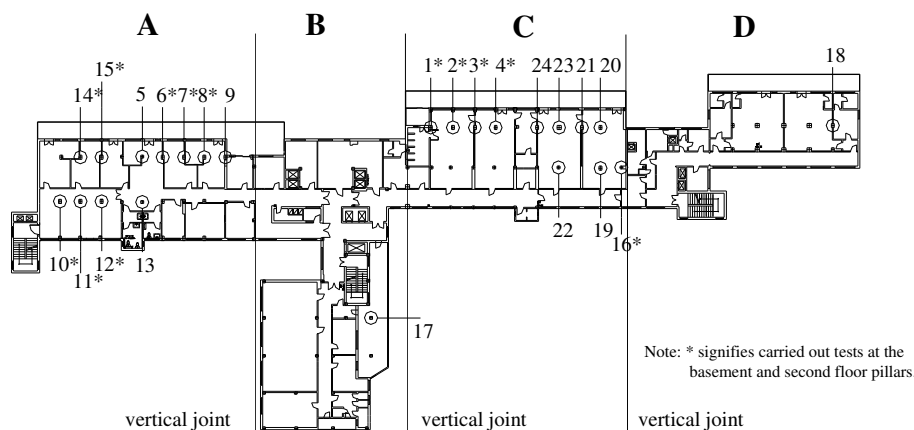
Horizontal plane section of a generic level, with vertical joints and tested pillars reported.
